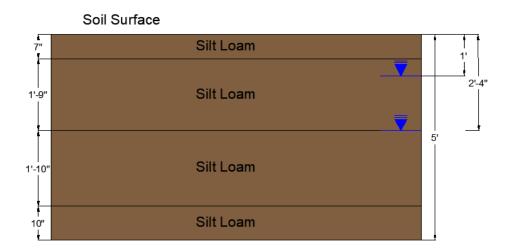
Typical Soil Profile <u>Required Soils Needed for Design and Construction</u>
